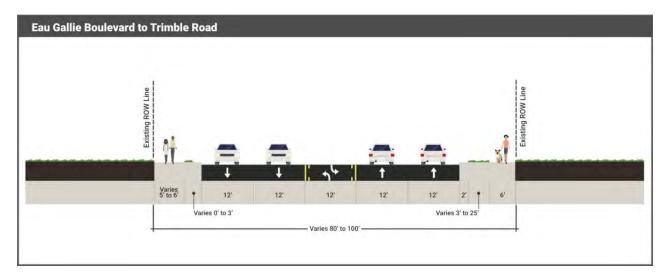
Existing Typical Section – Wickham Road from Eau Gallie Boulevard to Trimble Road
